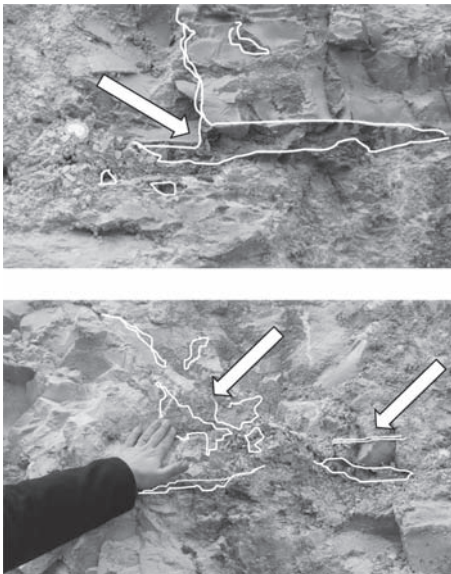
Excavation works, after the grouting treatment. The arrows point to the treatment.
